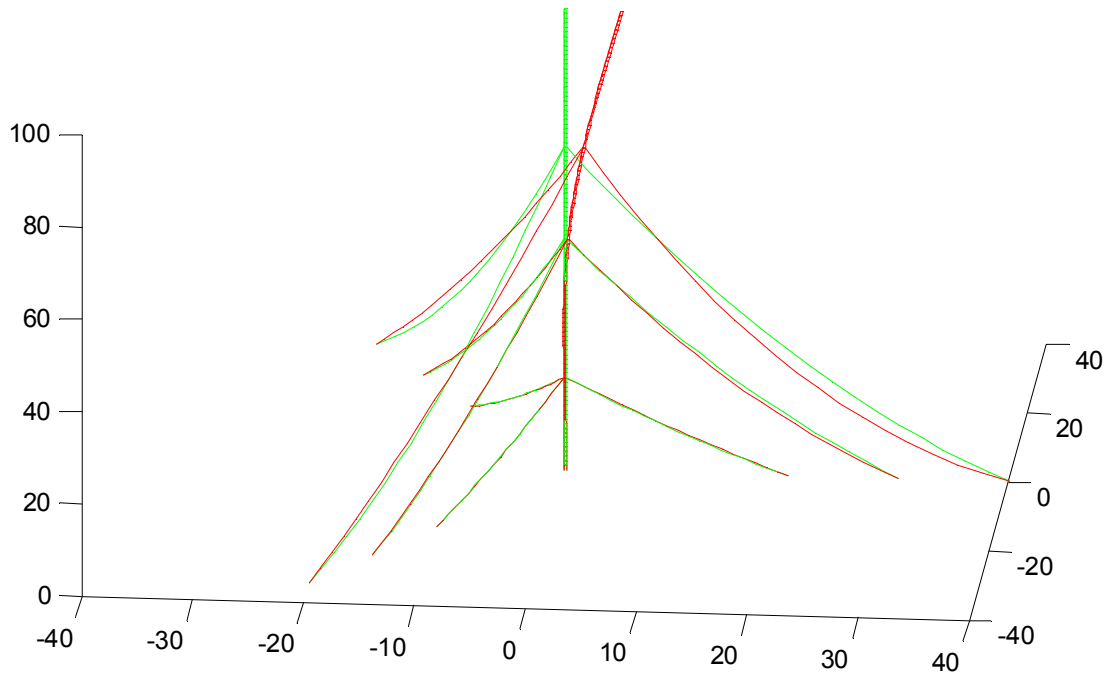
Deformed and undeformed geometres of a 100 m guyed tower.
